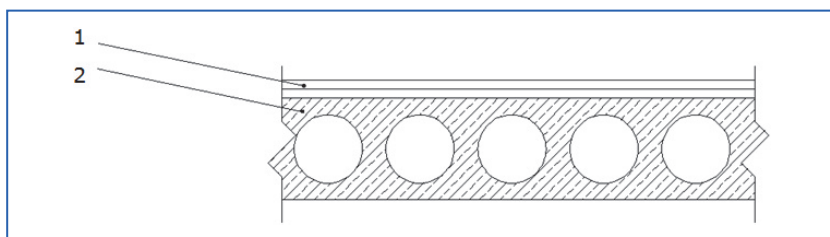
Floor. 1) Wooden floor; 2) 220 mm precast hollow concrete slab.
